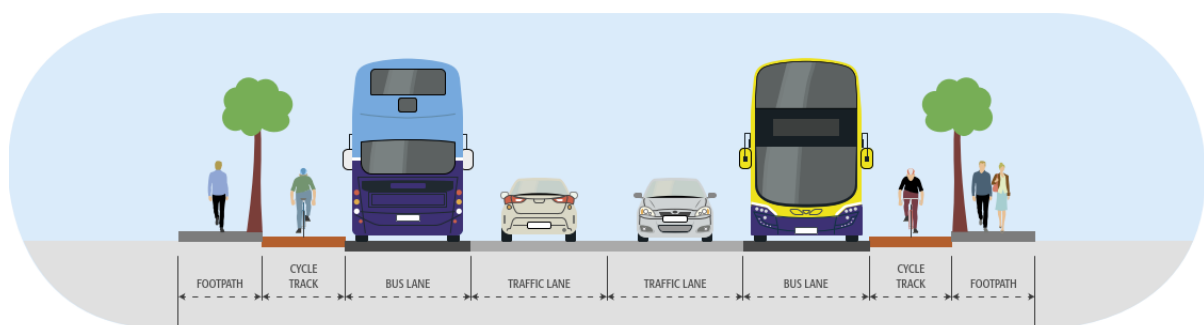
Typical BusConnects Road Layout (PDGP)-Section
